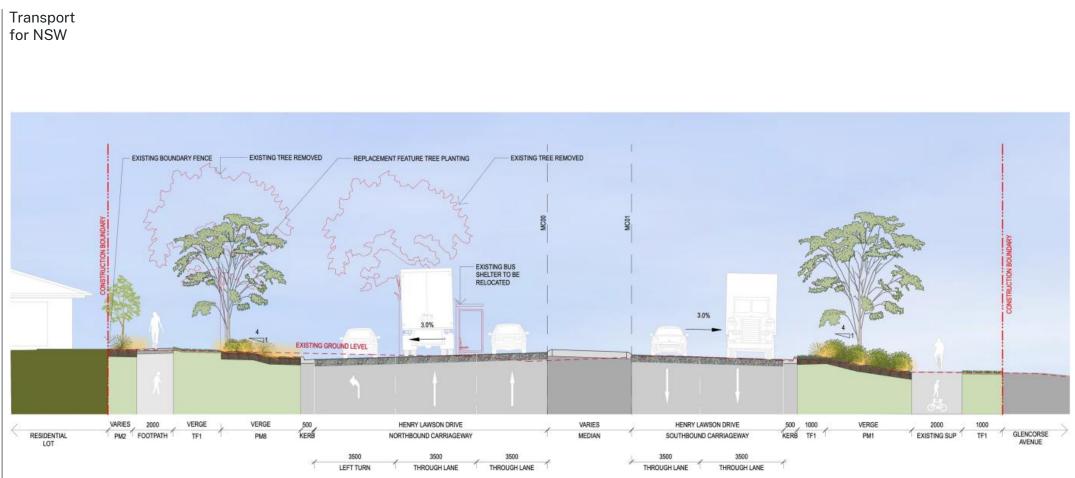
Typical cross section – Henry Lawson Drive south of Pozieres Avenue
